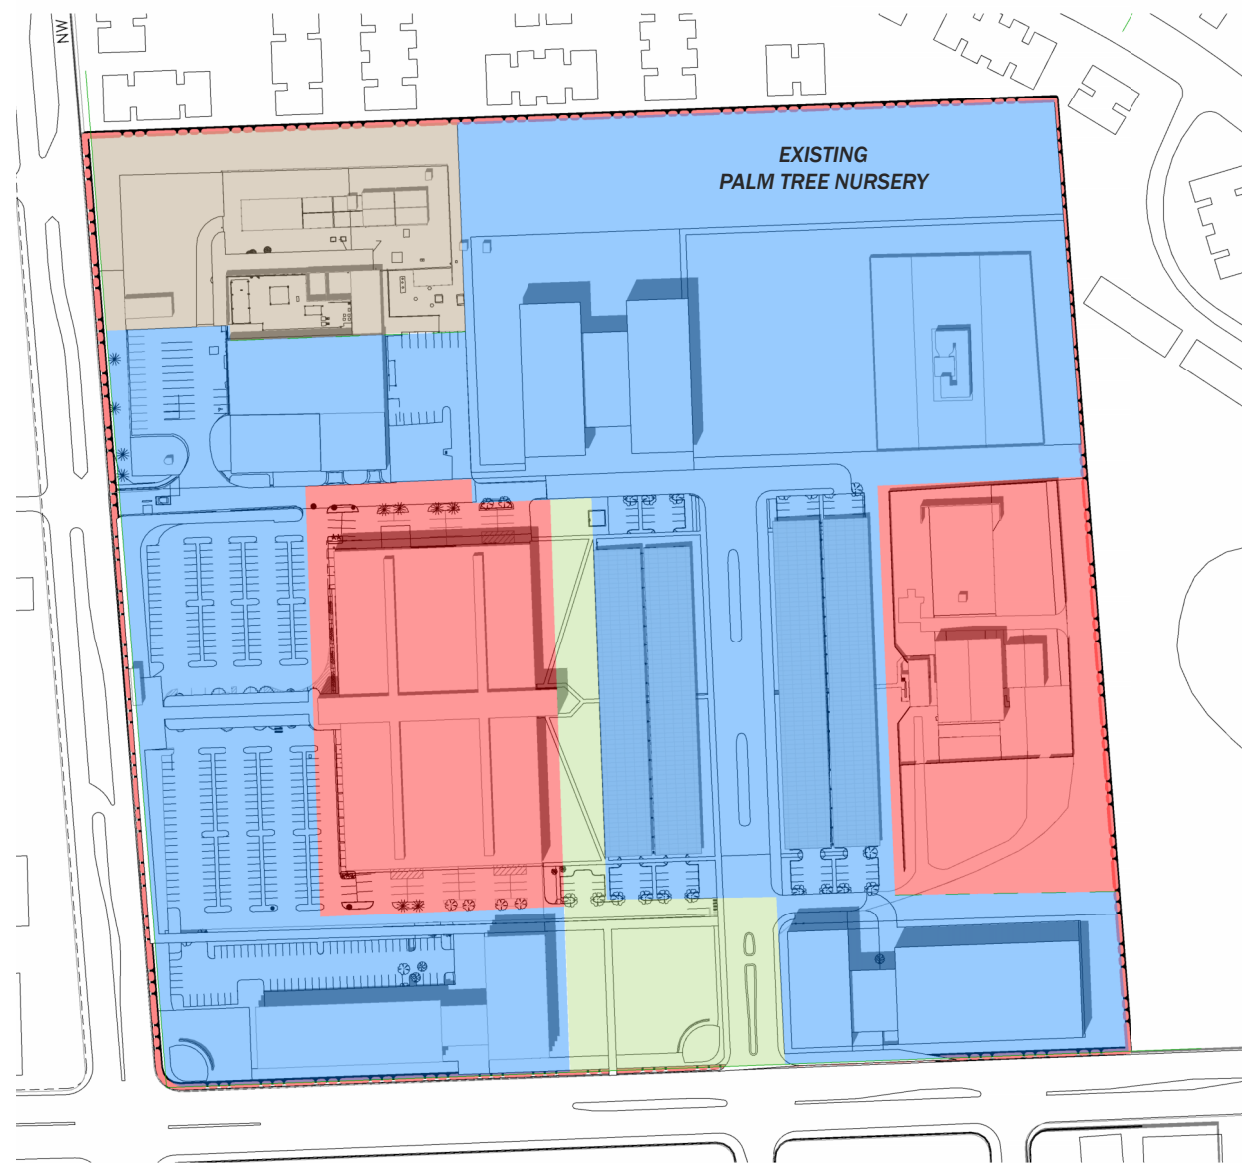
EC 2035 PLAN LAND USE PLAN
